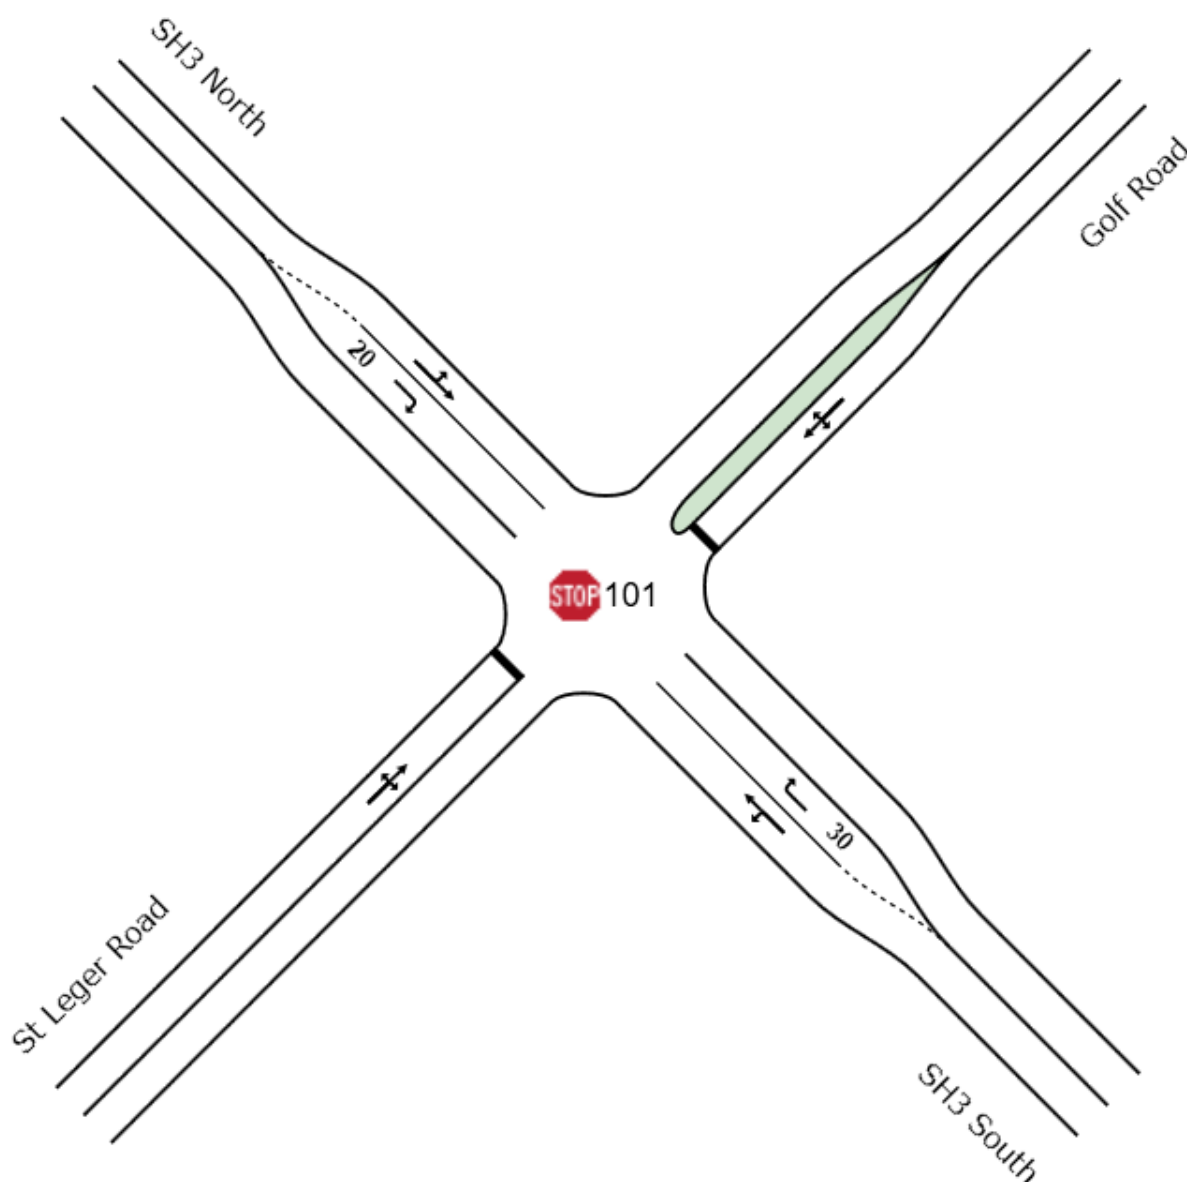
Sidra Intersection Diagram – State Highway 3 / Golf Road / St Leger Road
